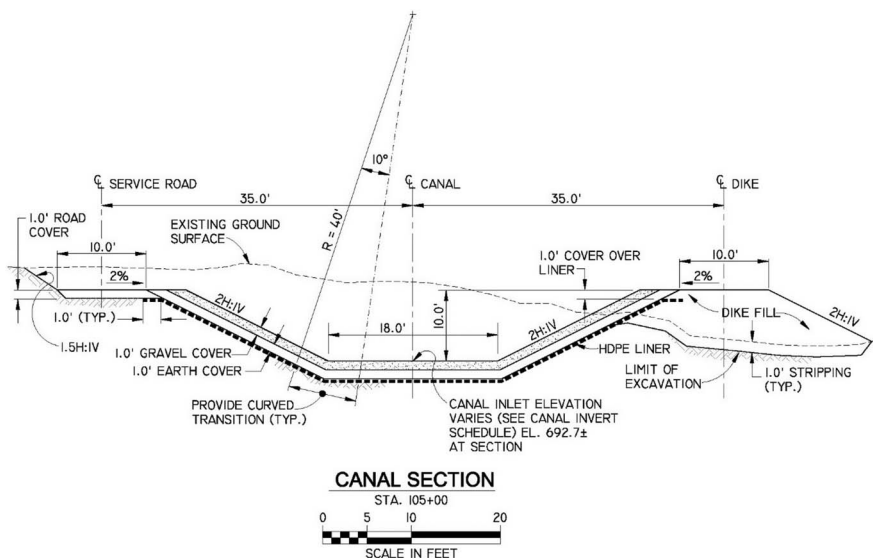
HDPE Liner Section for a Canal Final Design Project
